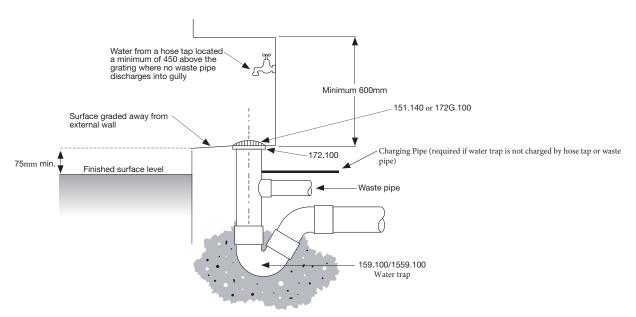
Typical positioning of Overflow Relief Gully outside a building (Ref AS/NZS 3500.2)
